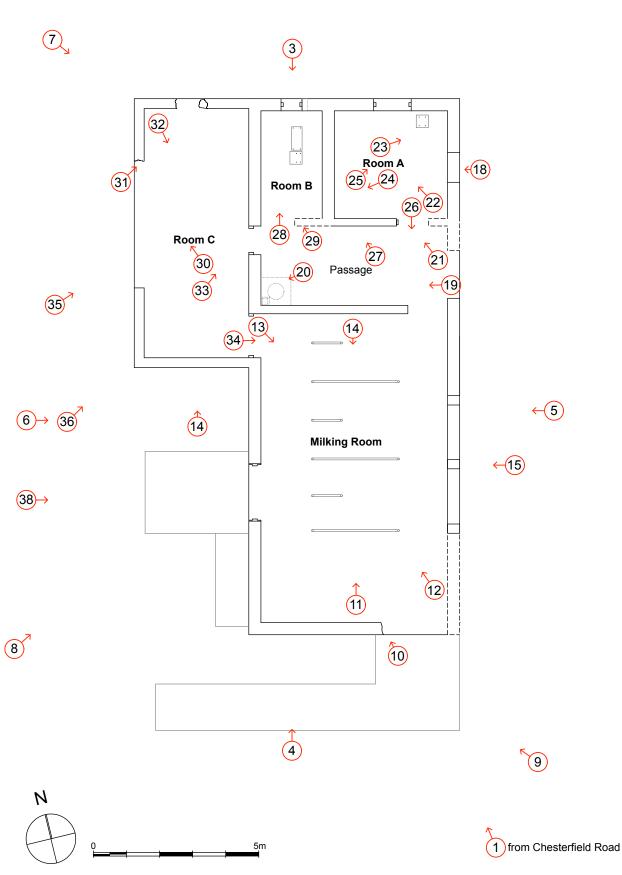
Floor plan showing number and direction of photographs (Palassis Architects, April 2009)
